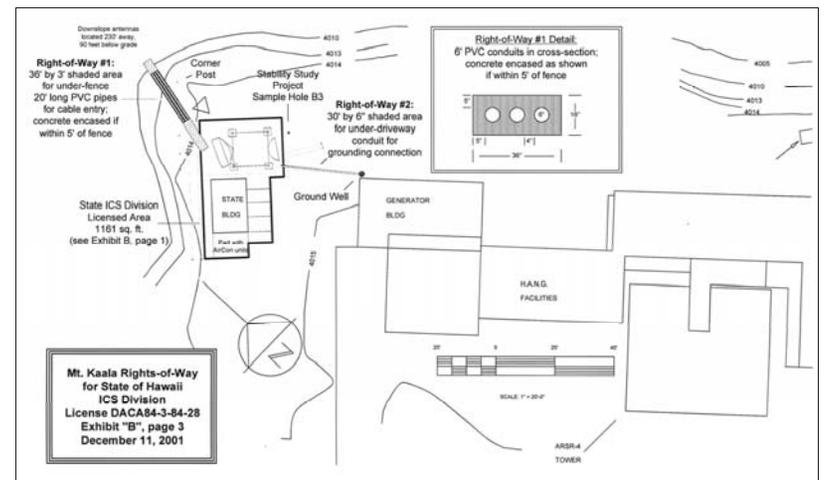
Plan showing relationship of State Building and conduit extending toward down slope antennas
